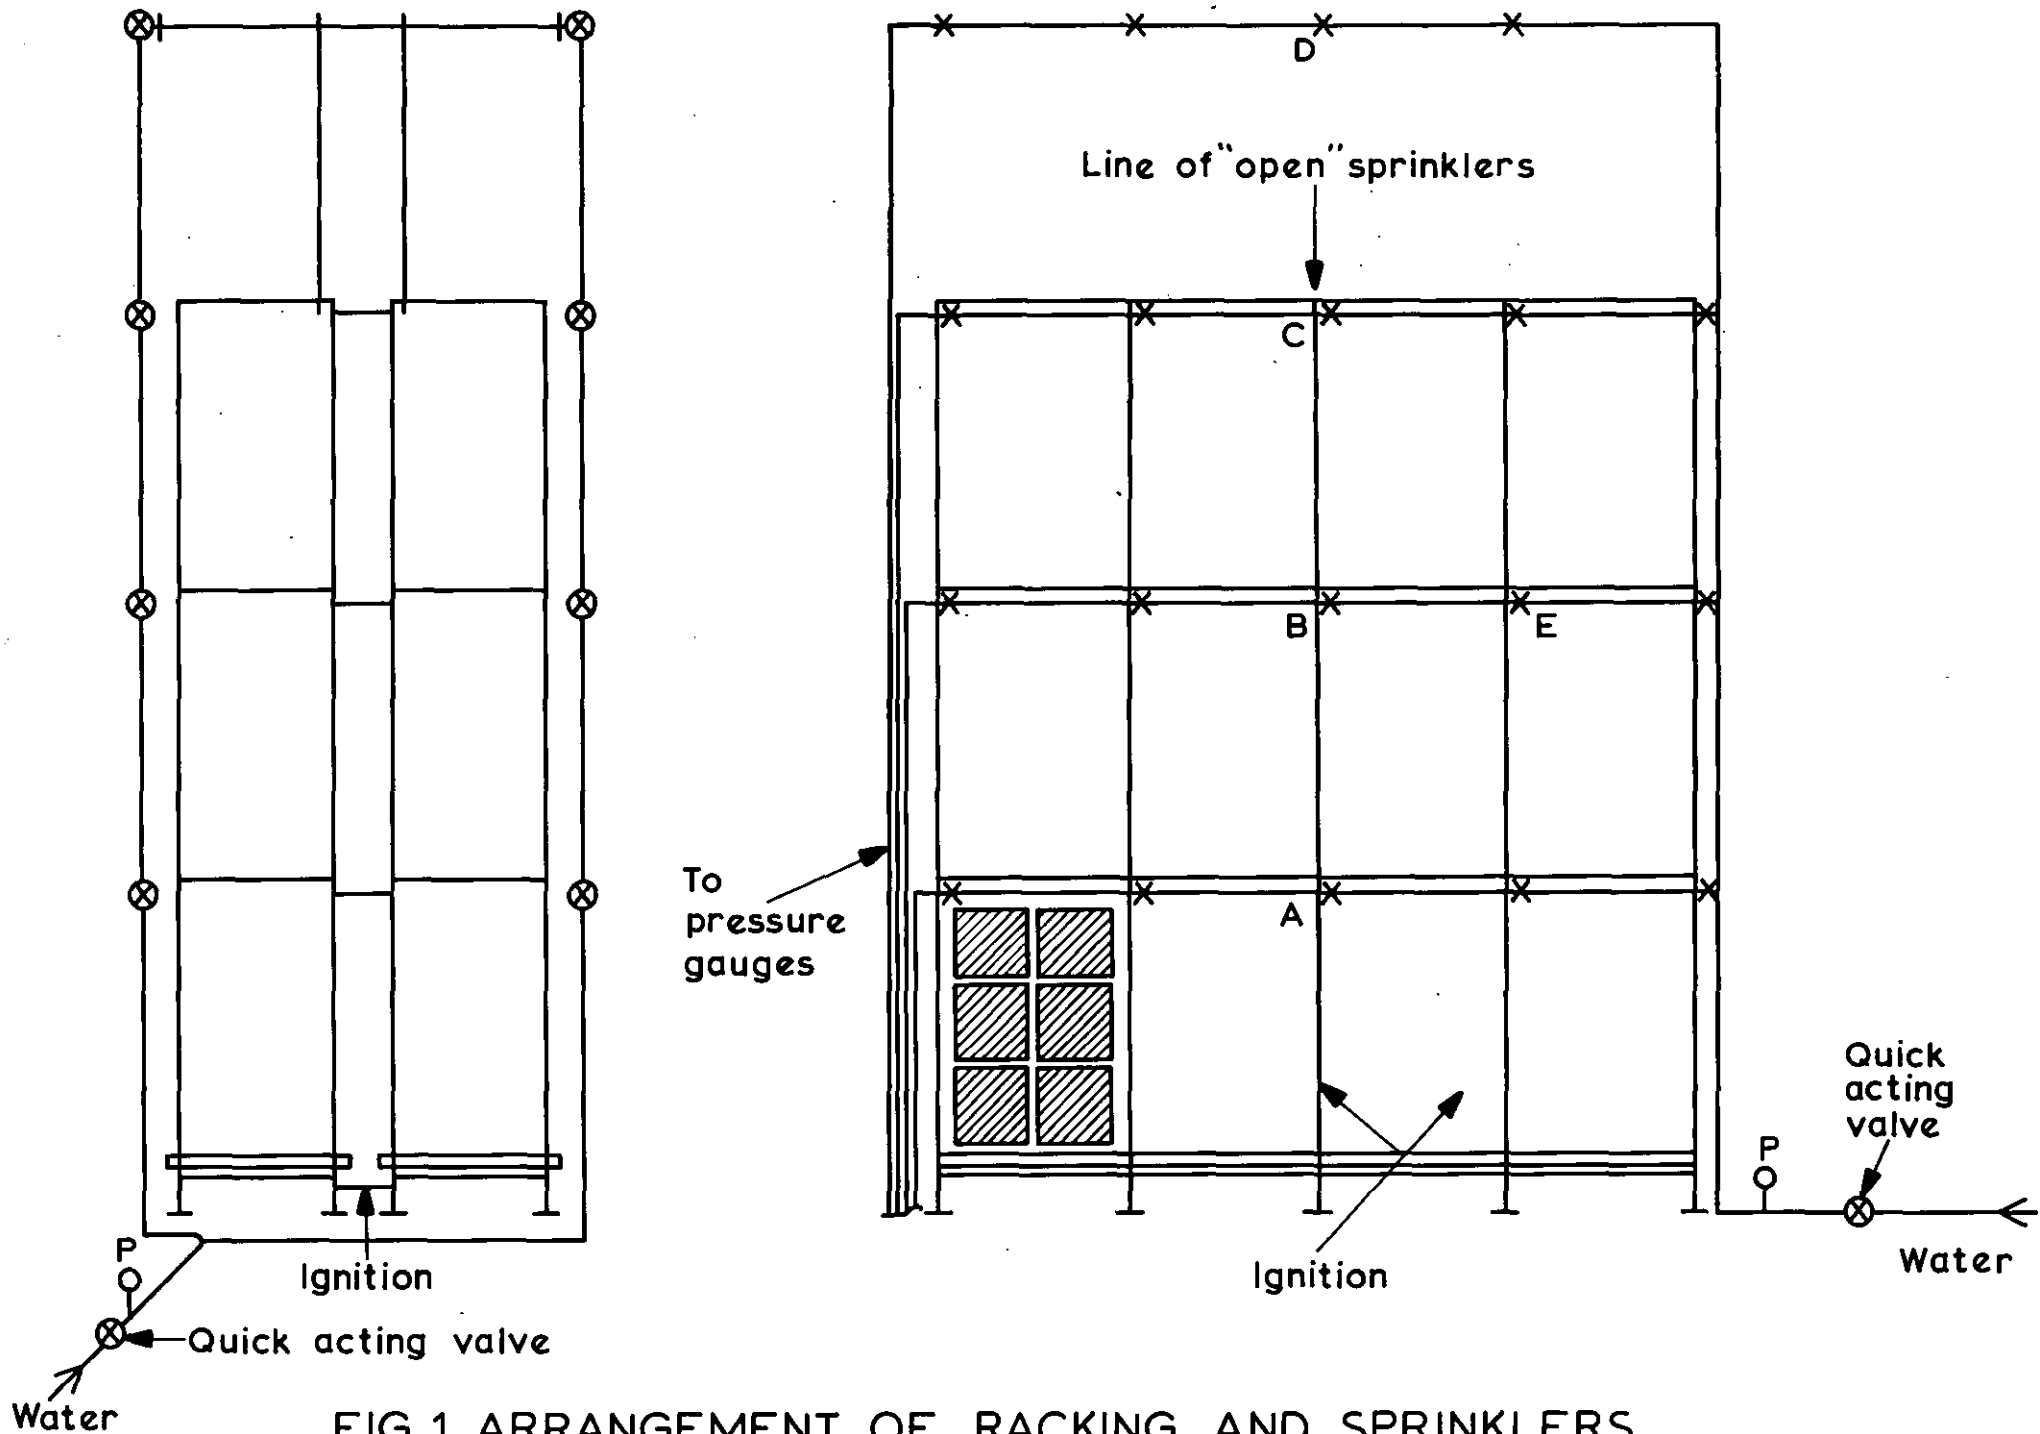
ARRANGEMENT OF RACKING AND SPRINKLERS
